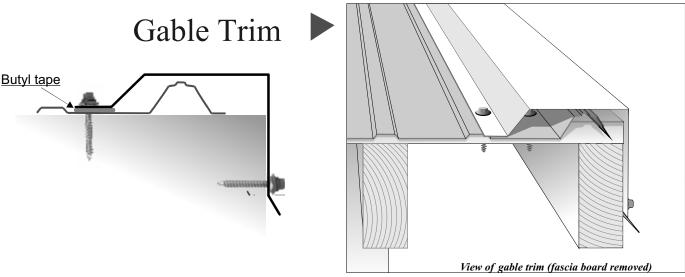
Gable trim is used to trim the edge of the roofing panel at the gable end of the roof. If the panel is allowed to hang over the gable end, eave drip can be used instead. Butyl tape between the trim and panel eliminates leaks.
